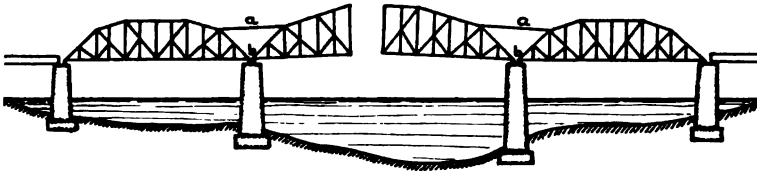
k*.—Erecting a Truss by Cantilever Method.
